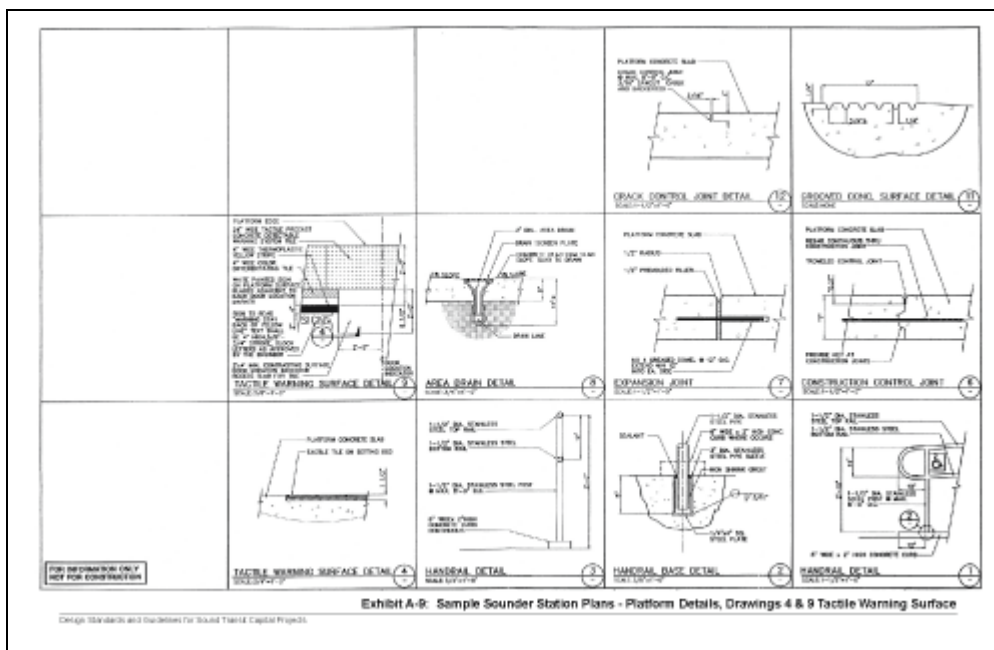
Sample Sounder Station Plans – Platform Details, Drawings 4 & 9 Tactile Warning Surface (1.4 MB)
